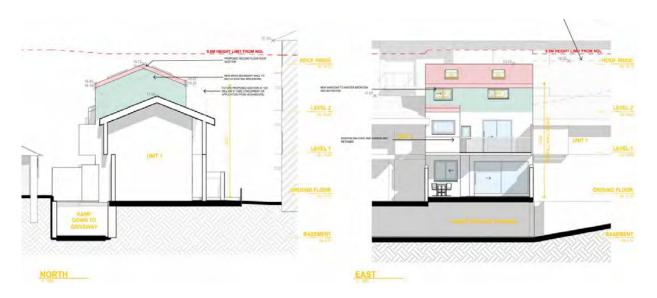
Originally proposed north and east elevations (DA-15/2022)
